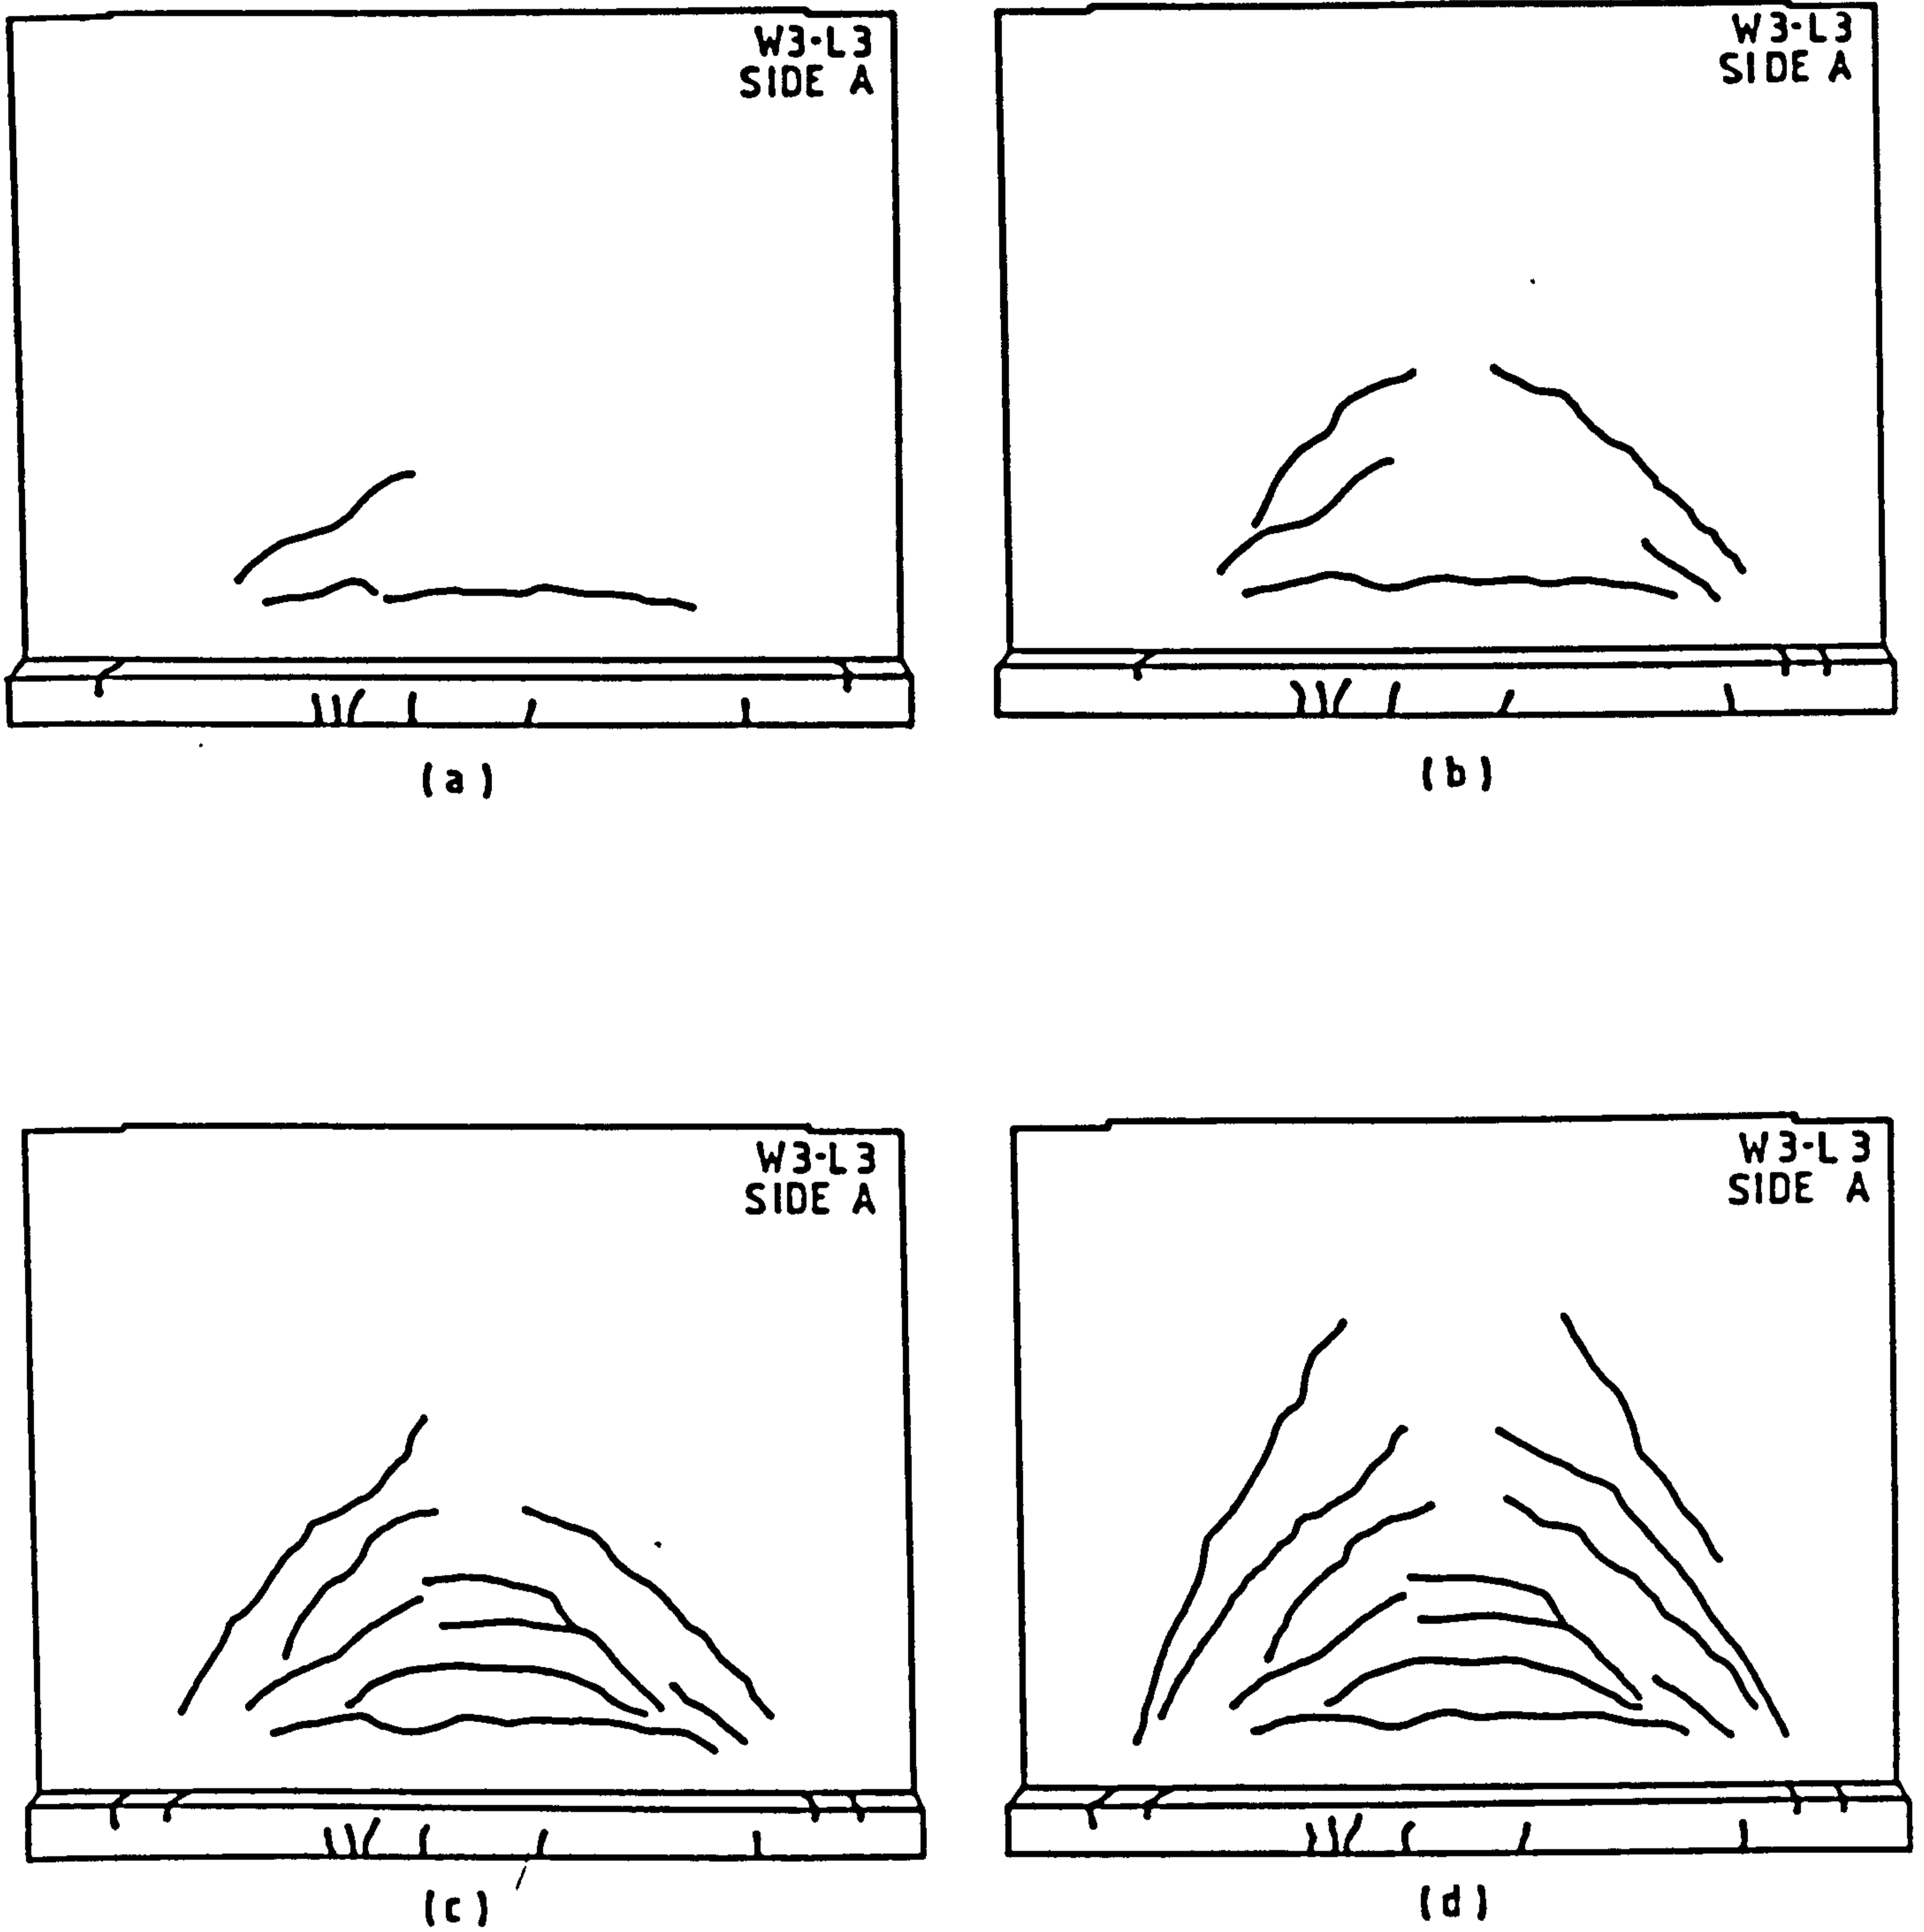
Development of cracks in wall W3-L3
